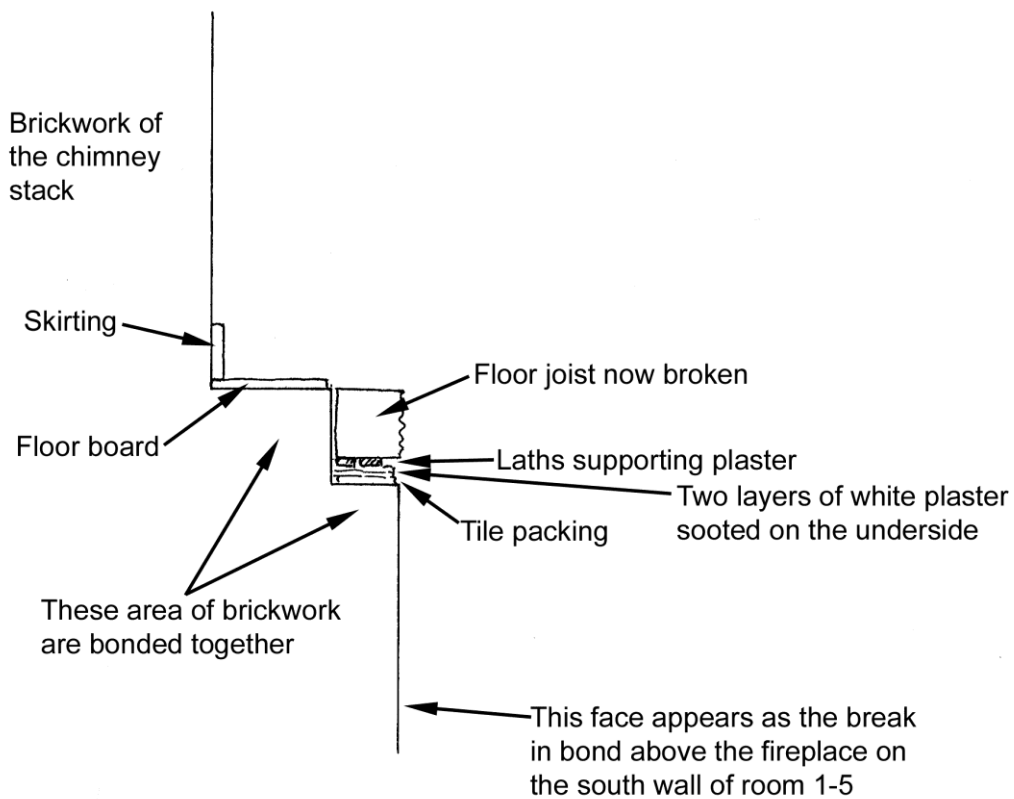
Section through the eastern face of the east chimney-stack at first floor level above the oven. Looking north.
